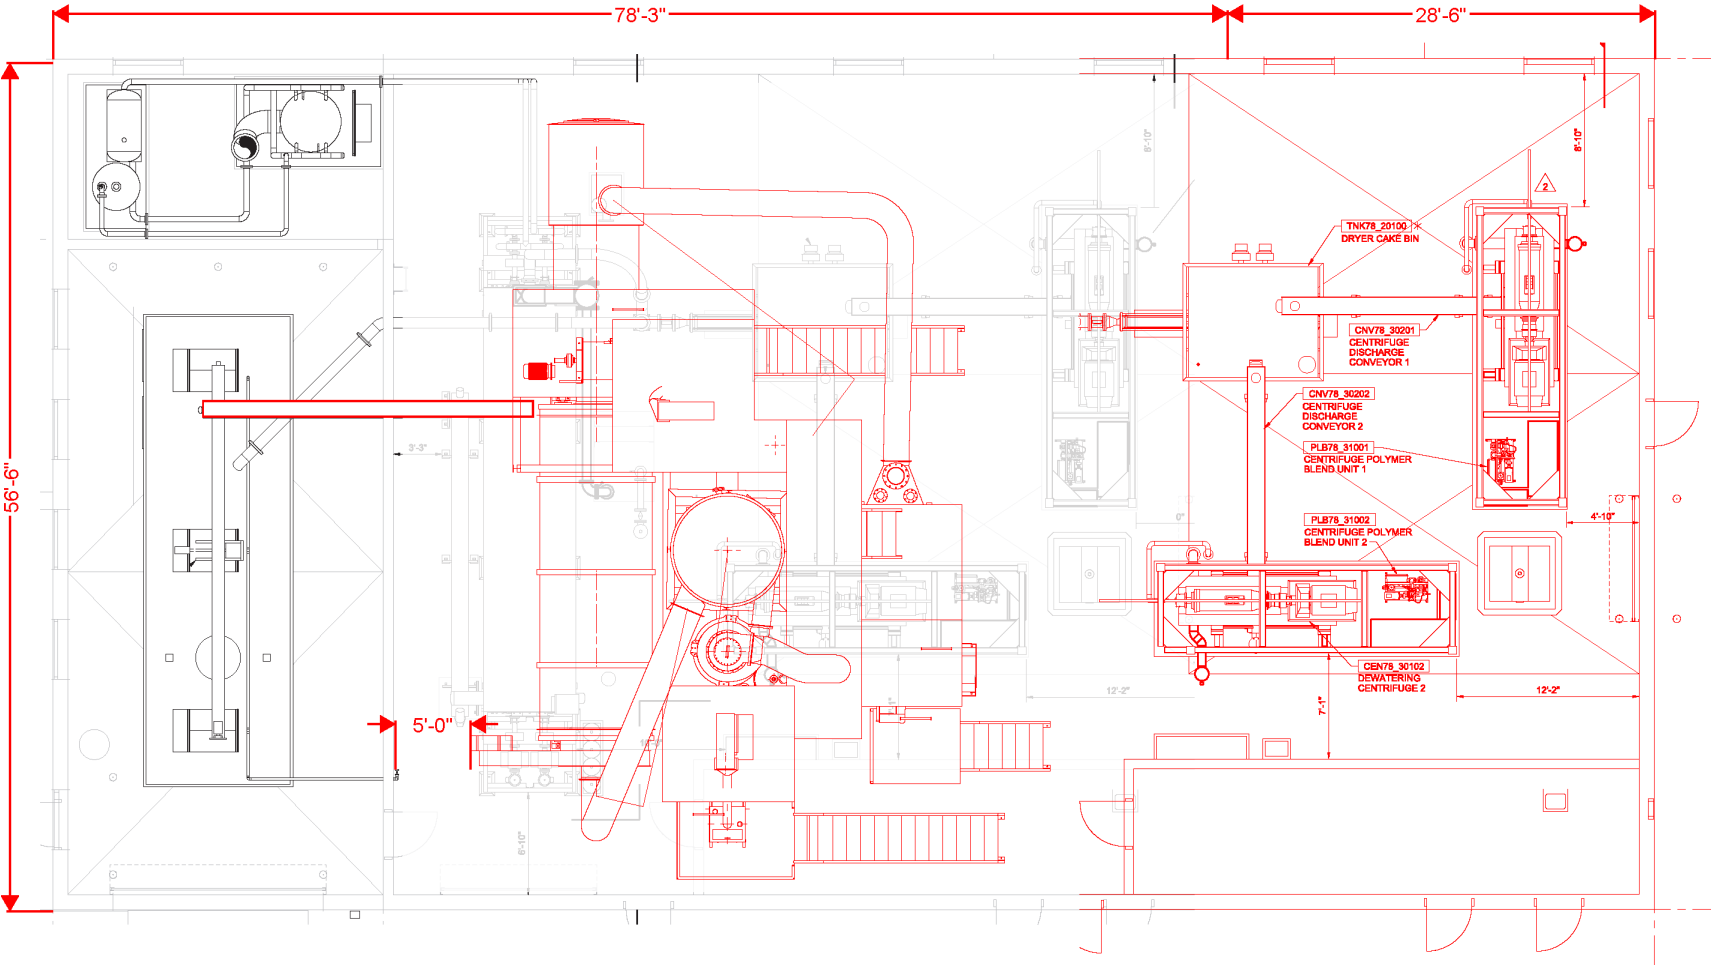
Dewatering and Dryer Building Modification for Drum Dryer System
